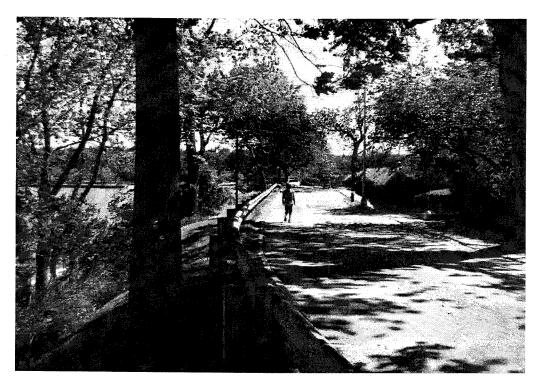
View of Shore Road Collapse No. 1 (between Bayview Avenue and West Drive) looking north from the north side of the Shore Road/Bayview intersection. The Outfall No. 2 location is to the left (west) of the guardrail.
